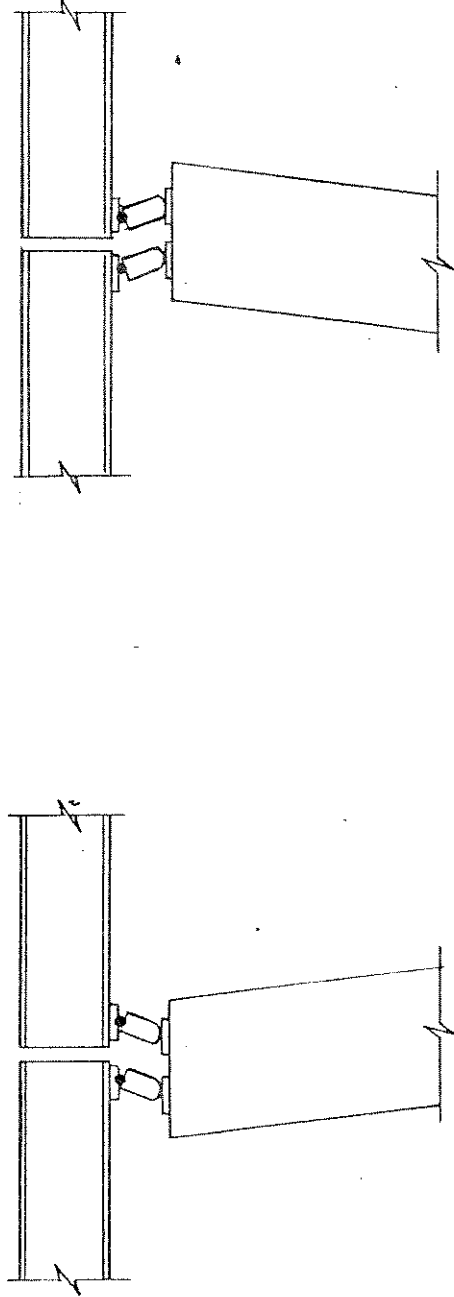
DETAIL OF MOVEMENT AT PIERS 1 AND 6
